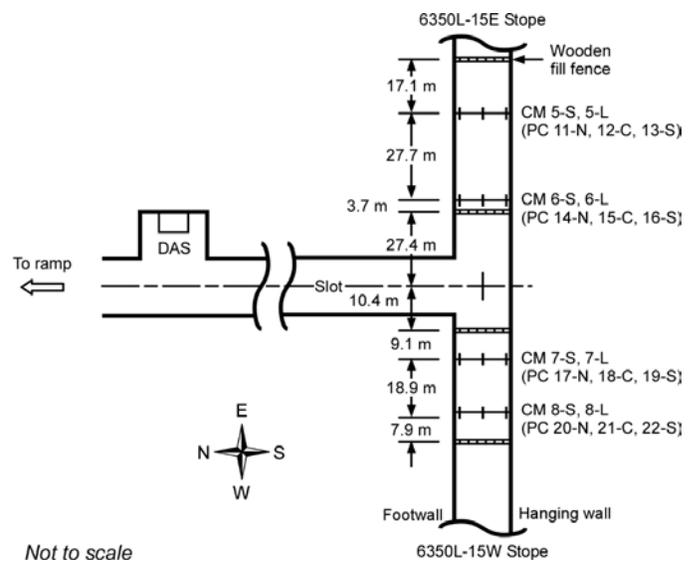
Plan view of 6350-level, 15-stope backfill instrumentation sites.
